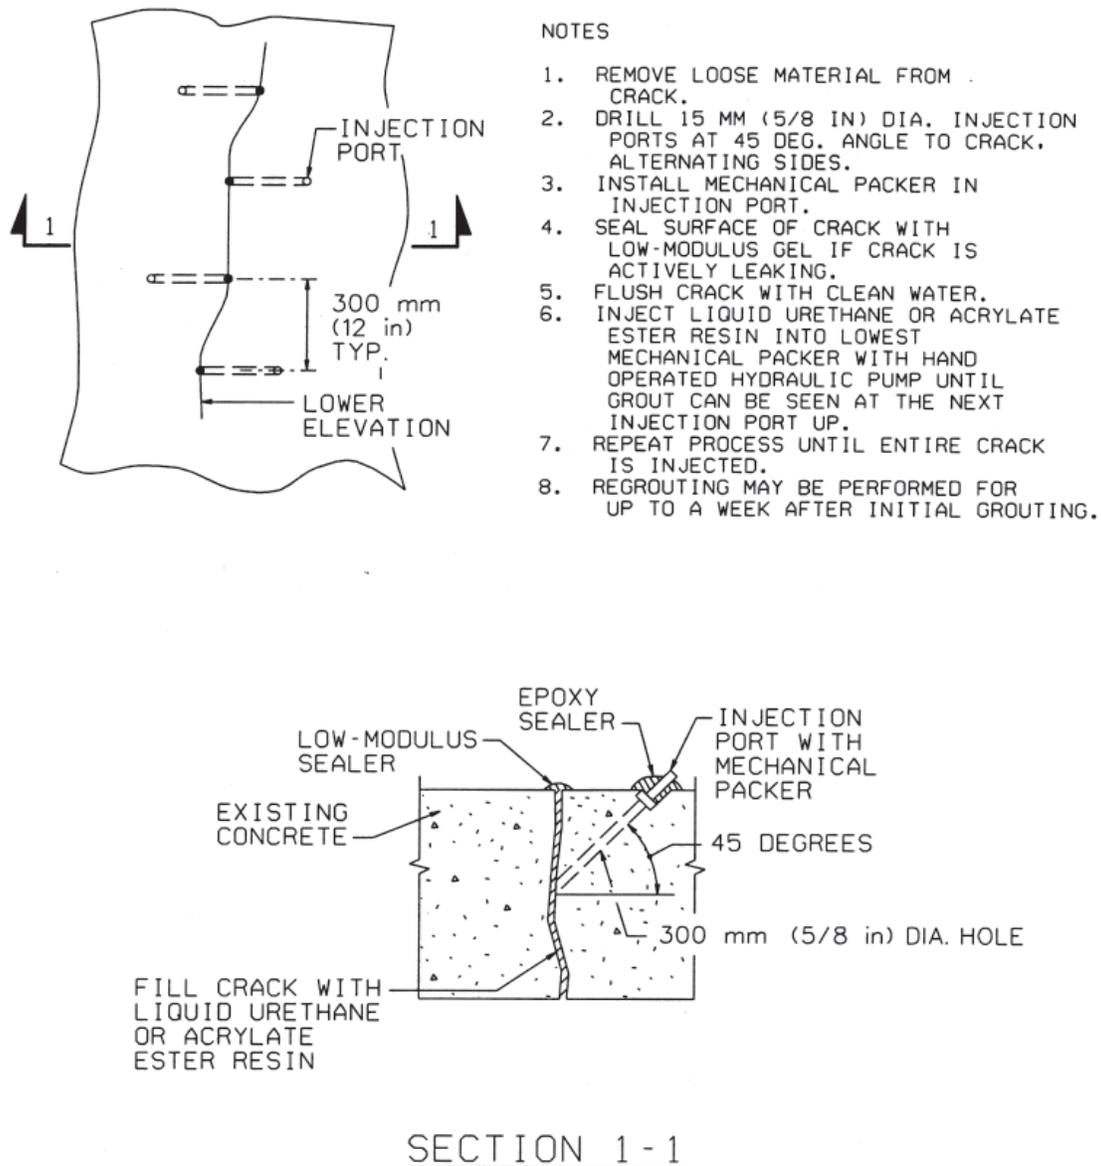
Typical Location of Injection Ports and Leaking Crack Repair Detail (FHWA, 2005b)
